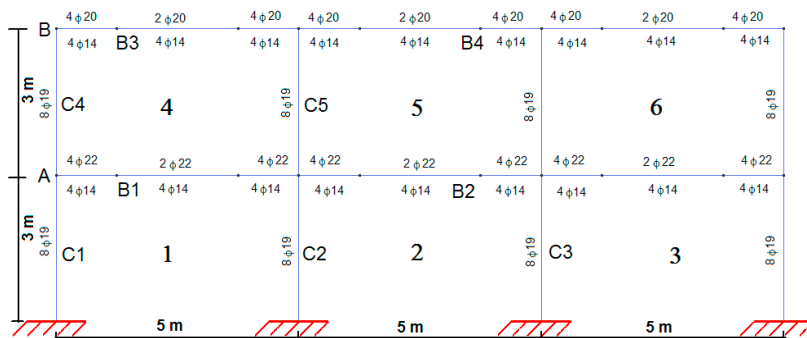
Frame geometry, support conditions, reinforcement, numeration of: beams, columns, joints and bays
